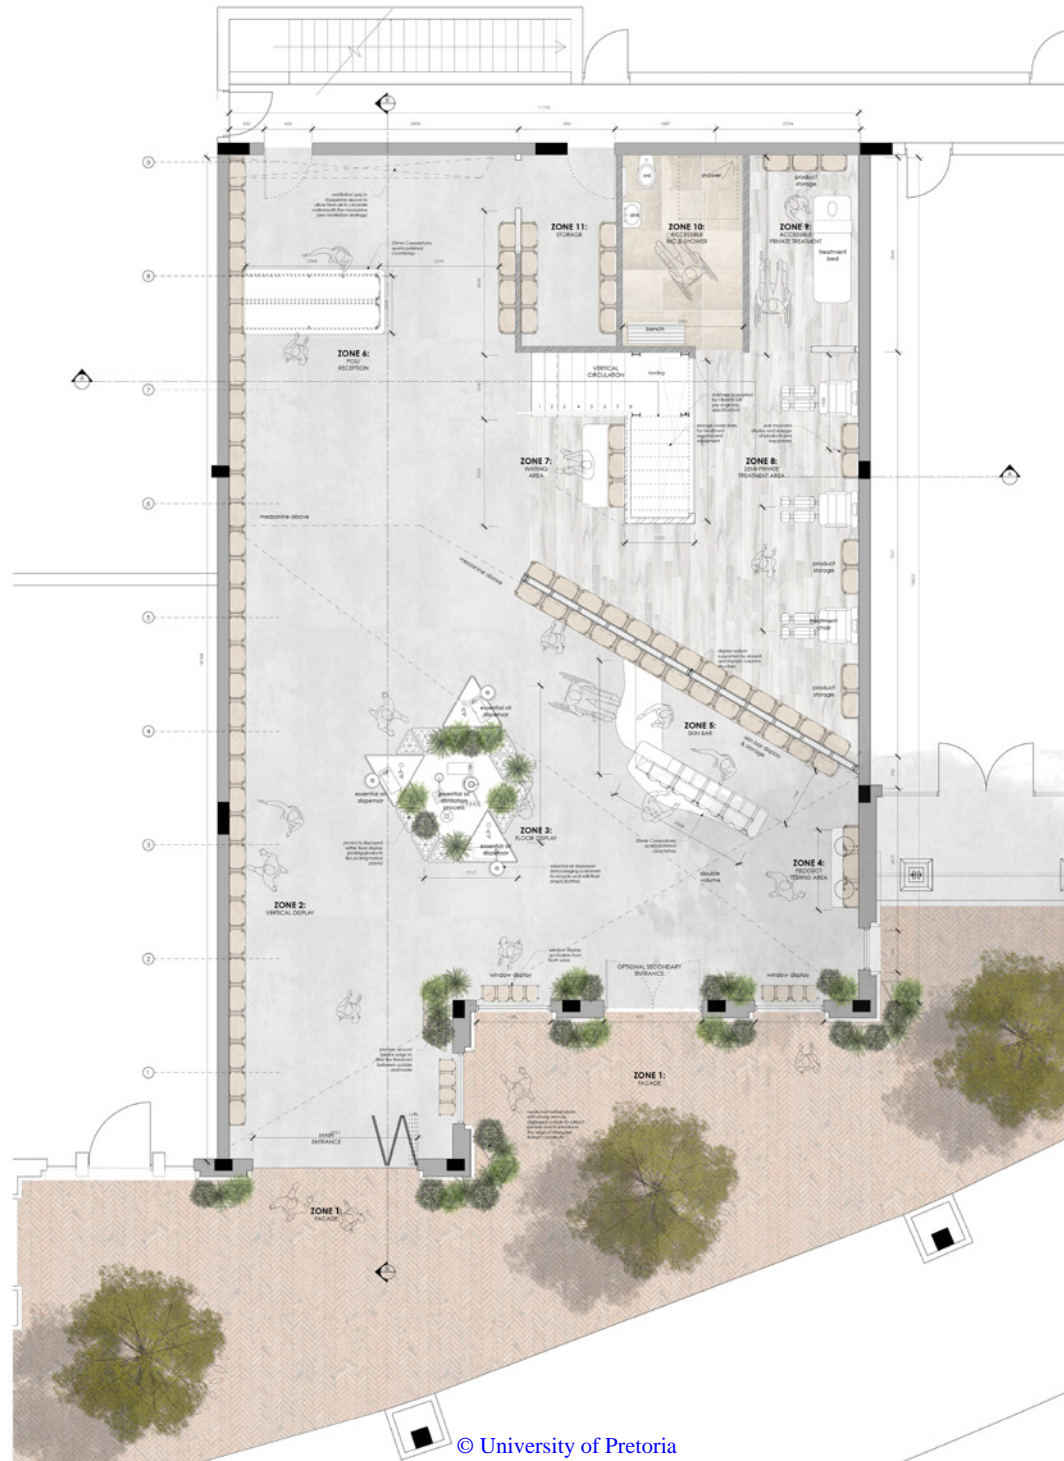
Iterated Ground Floor Plan (Author, 2016)
